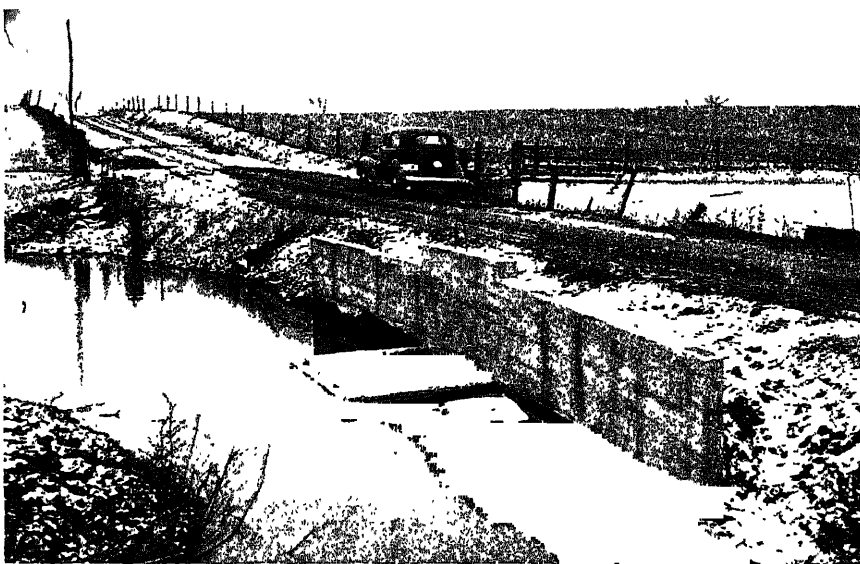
Entrance (riser or well) to drop inlet for passing runoff through a highway culvert. (Photograph by Soil Conservation Service.)
